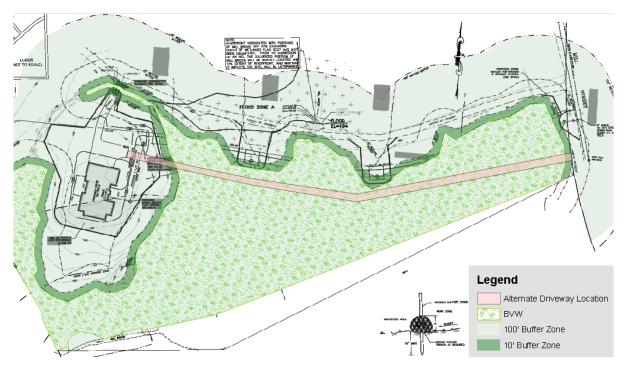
Impacts to Buffer one of BVW associated with the alternative construction of a new driveway.
